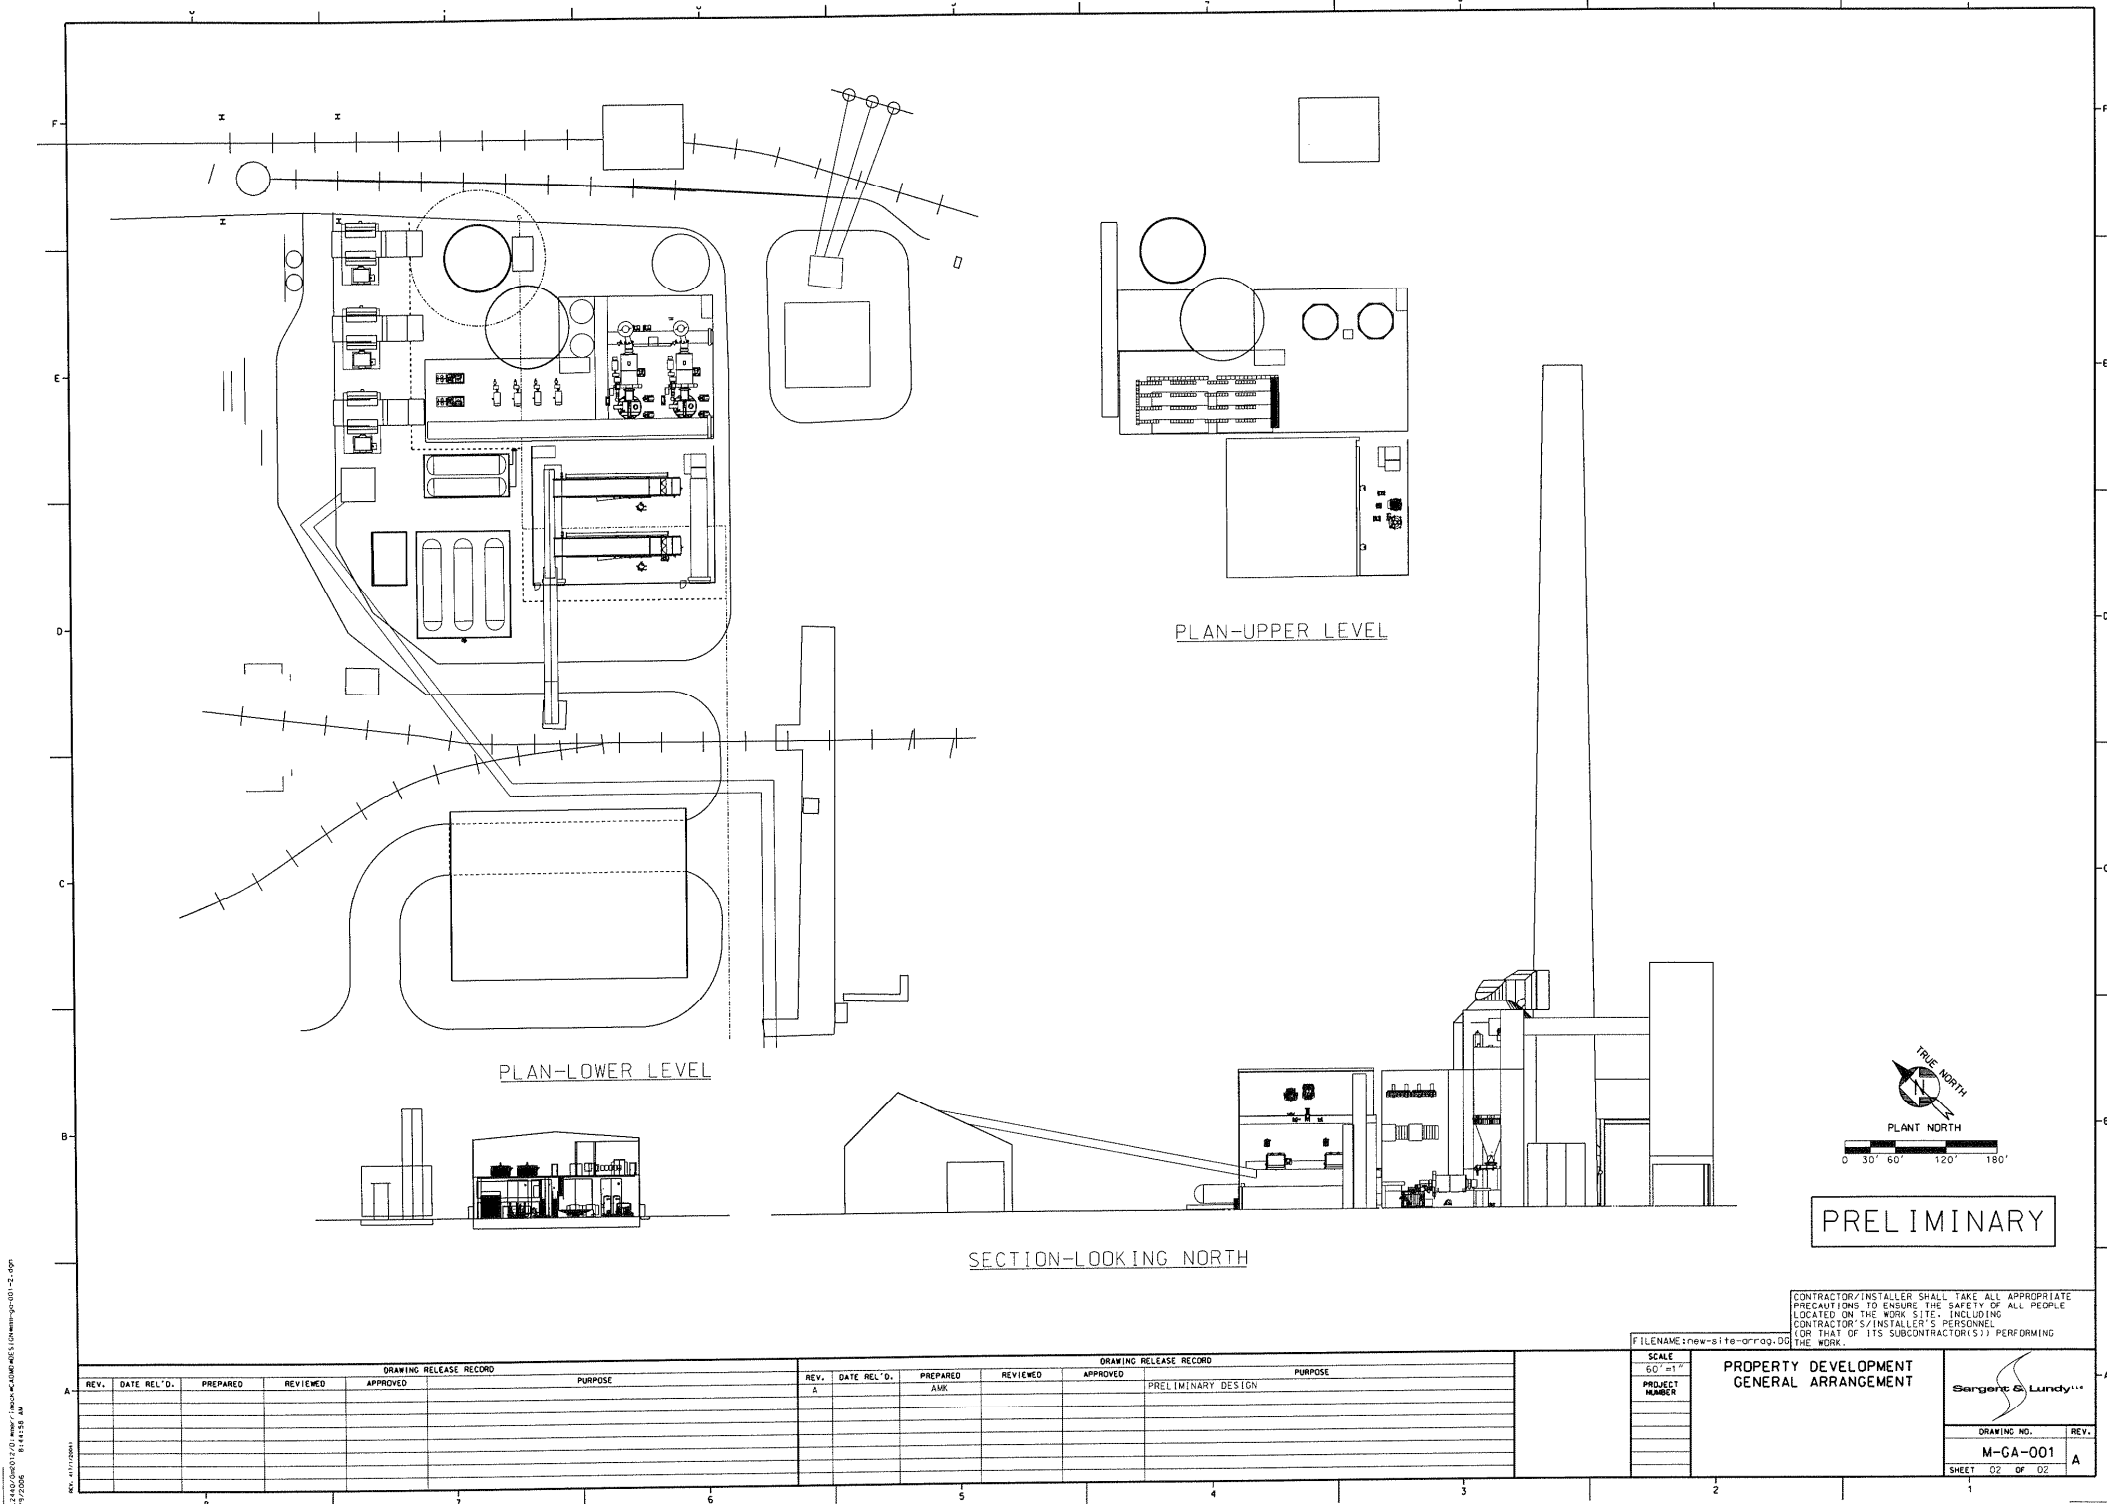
Figure F - Scrubber Drawings M-GA-001 Sheet 2
